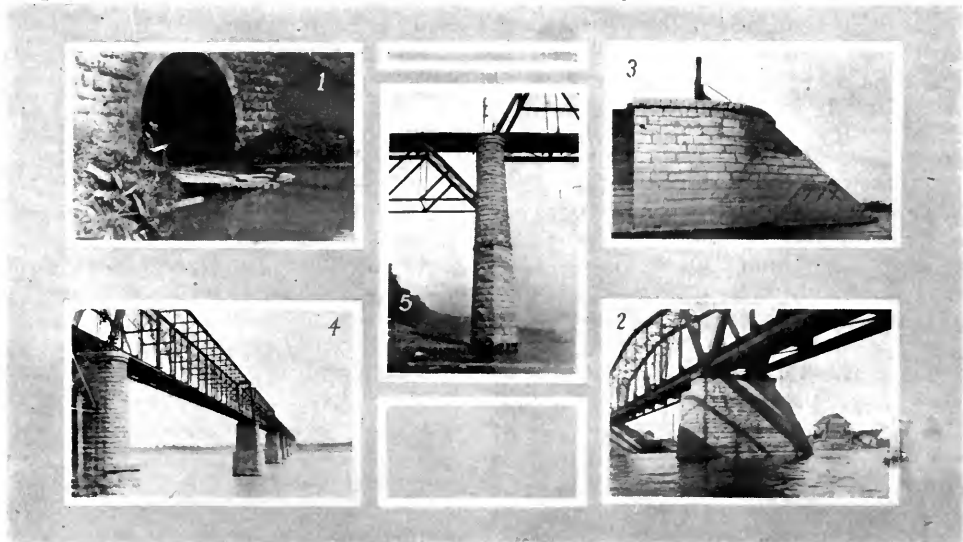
BR. W. 154.83. FIG. 2—PIER NO. 6, D. & D BRIDGE. FIG. 3—NOSE OF DRAW PIER PROTECTION, D. & D. BRIDGE. FIG. 4—GENERAL VIEW, CAIRO BRIDGE. FIG. 5—DOWN STREAM FACE PIER NO. 11, CAIRO BRIDGE.
